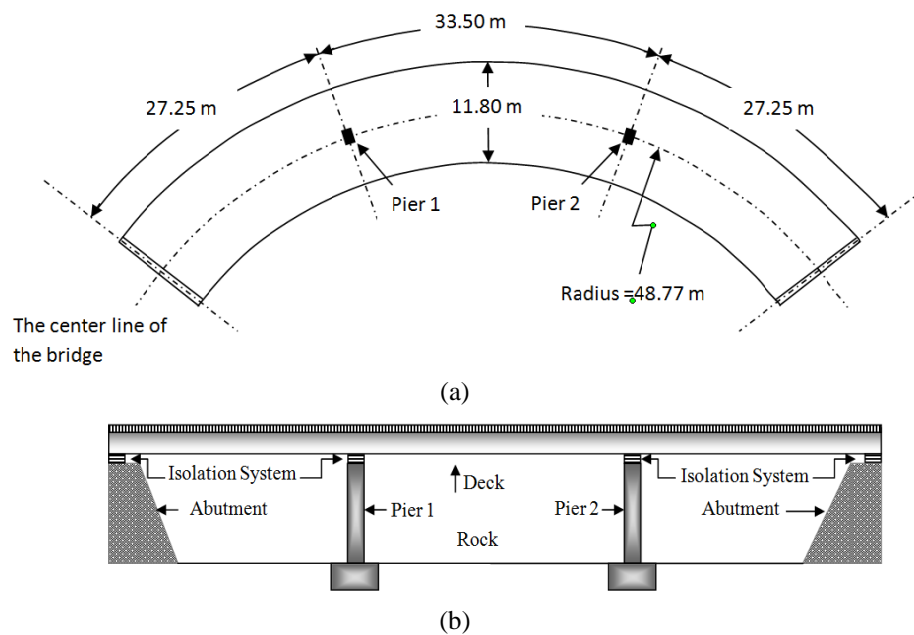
(a) The curved bridge plan, and (b) developed elevation
